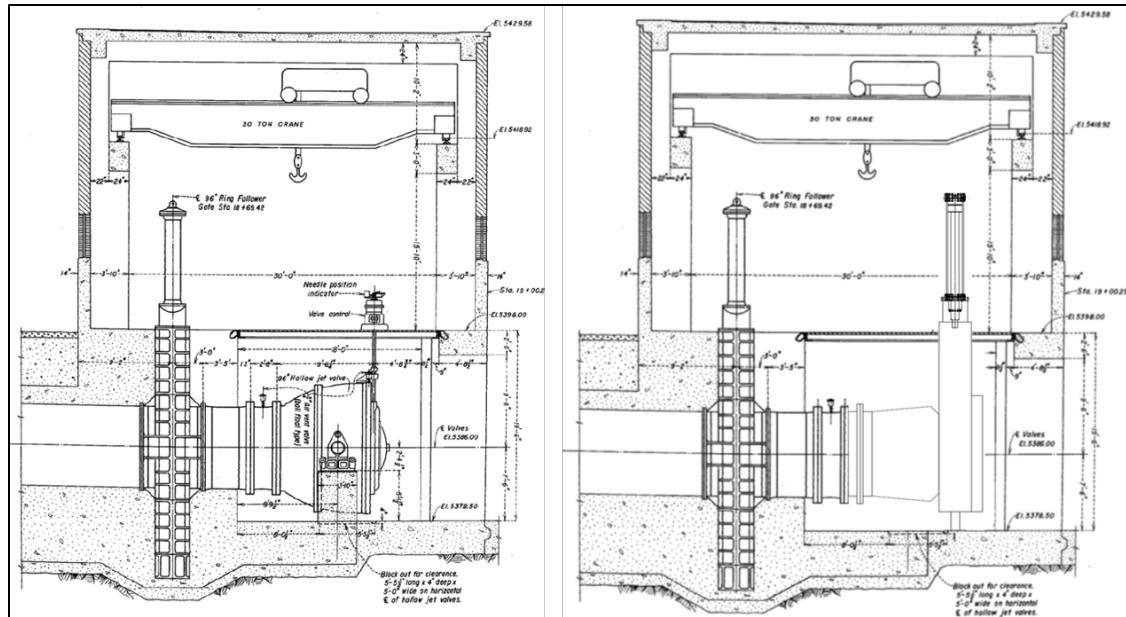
Drawing profile of existing 96-inch hollow-jet valve (left) and proposed jet-flow gate installation (right).
